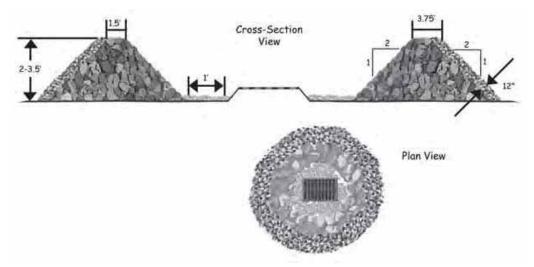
Rock Doughnut Inlet Protection Detail (NC-DENR 2013).
